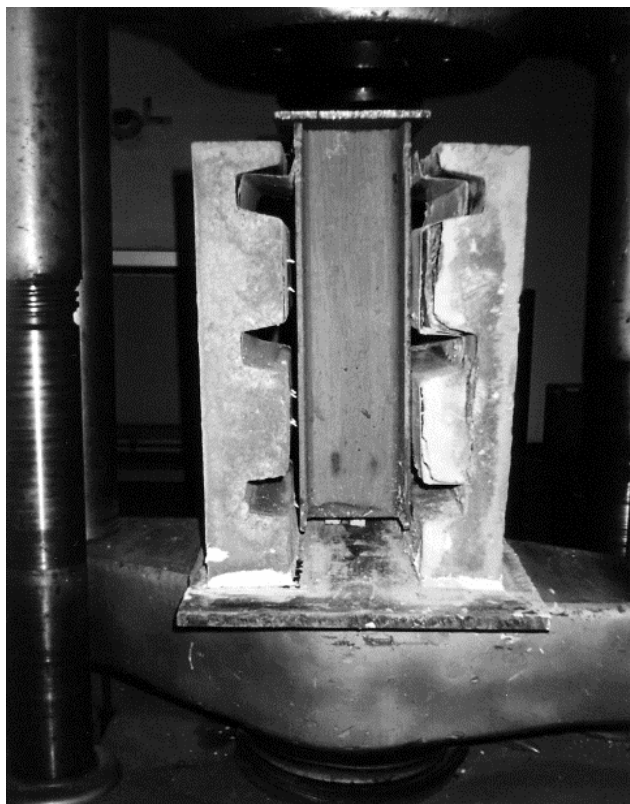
Model of shear connector: 1 - steel section, 2 - concrete slab on fluted sheet, 3 – slab reinforcement, 4 - connector tested (photo Nawrot, Kucharczuk, 2004)
